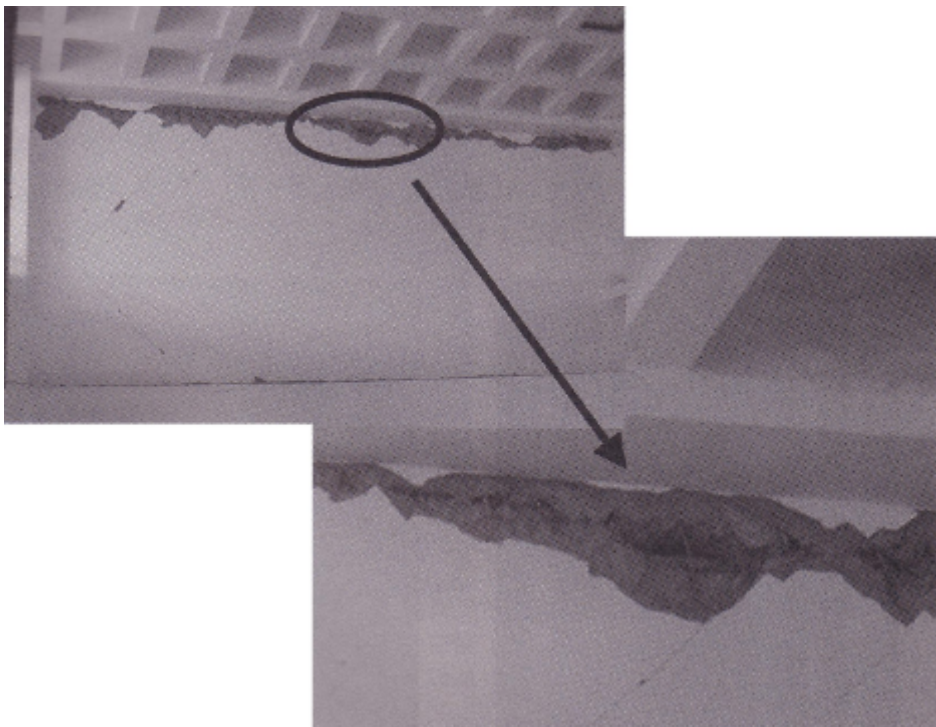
Diagonal cracks on the wall and cracks at the joint between lower column part and wall plate that was caused by sliding with local deformation of part of the vertical wall reinforcement.
